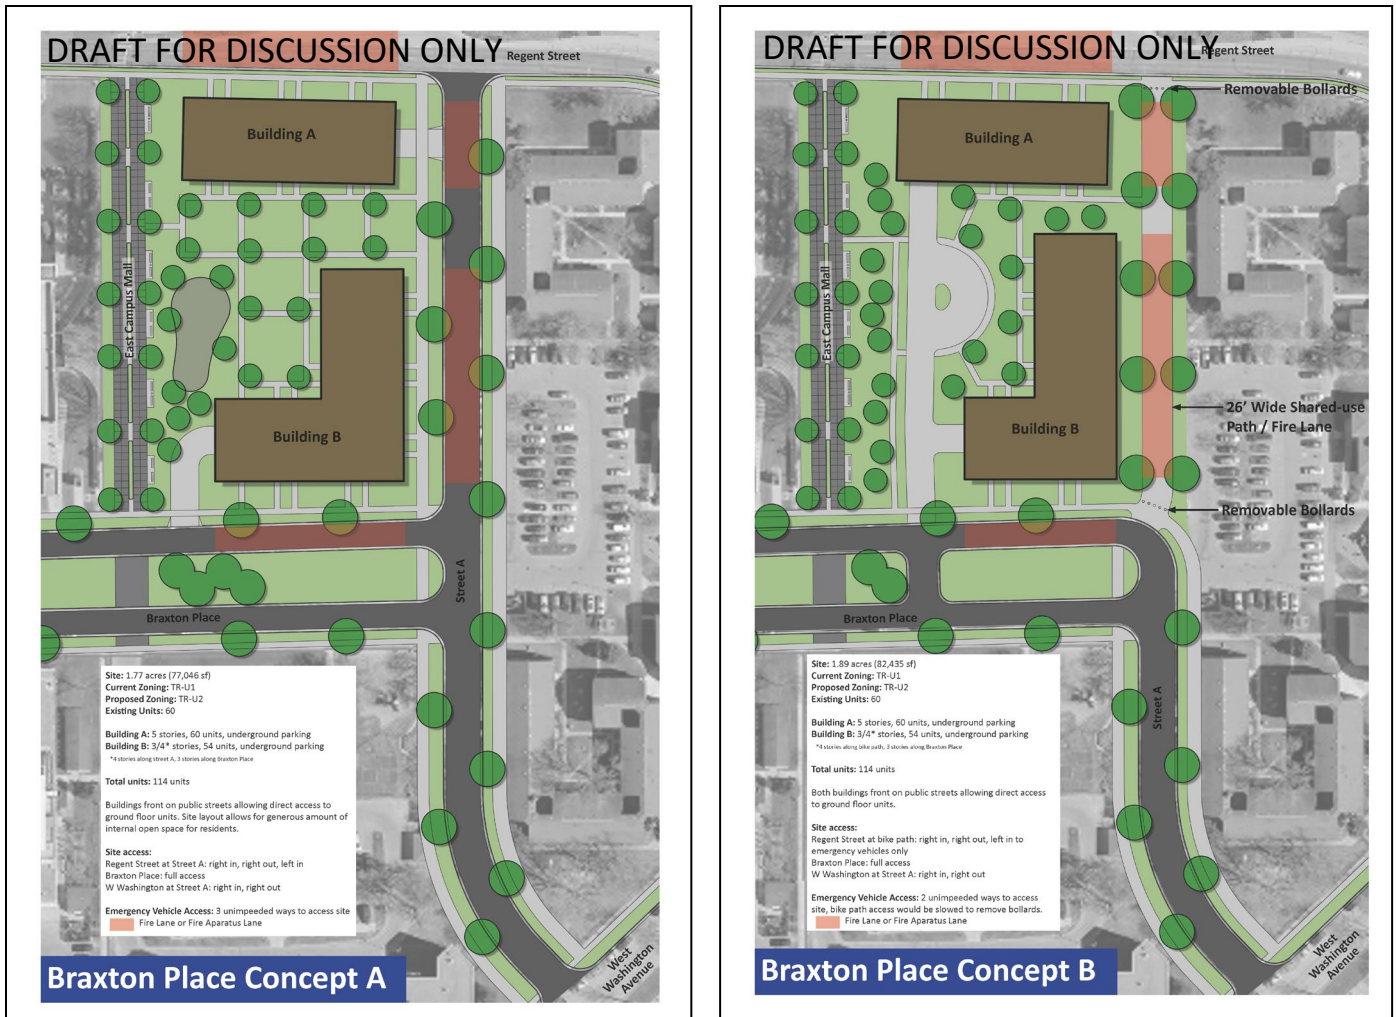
Draft Concepts for CDA Redevelopment with two different access options: Concept A shows a new street with multi-modal access, including vehicles, from Regent St. to W. Washington Ave. and Concept B shows a new street with multi-modal access for vehicles from Braxton Plc to W. Washington Ave. only, and ped/bike and emergency vehicle access only from Braxton Plc. to Regent St.
